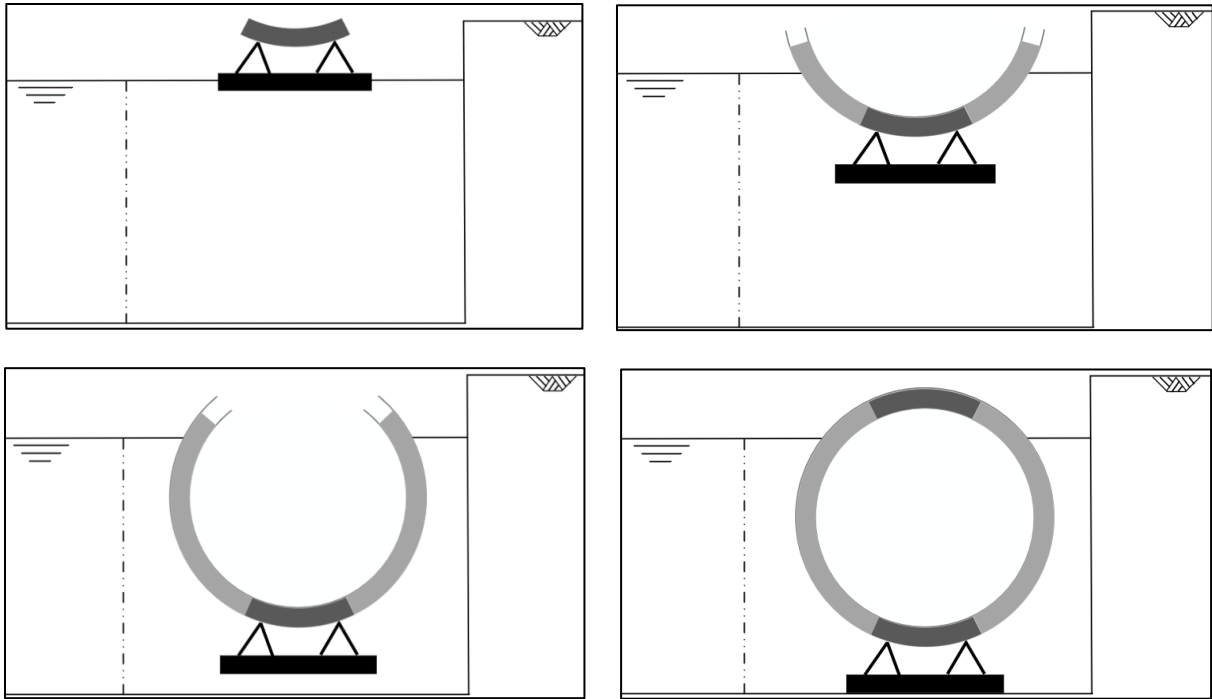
Printing outer and inner shell and casting of concrete (2D view) on a pontoon. The bottom and top element can be made with prefab elements (dark grey).
